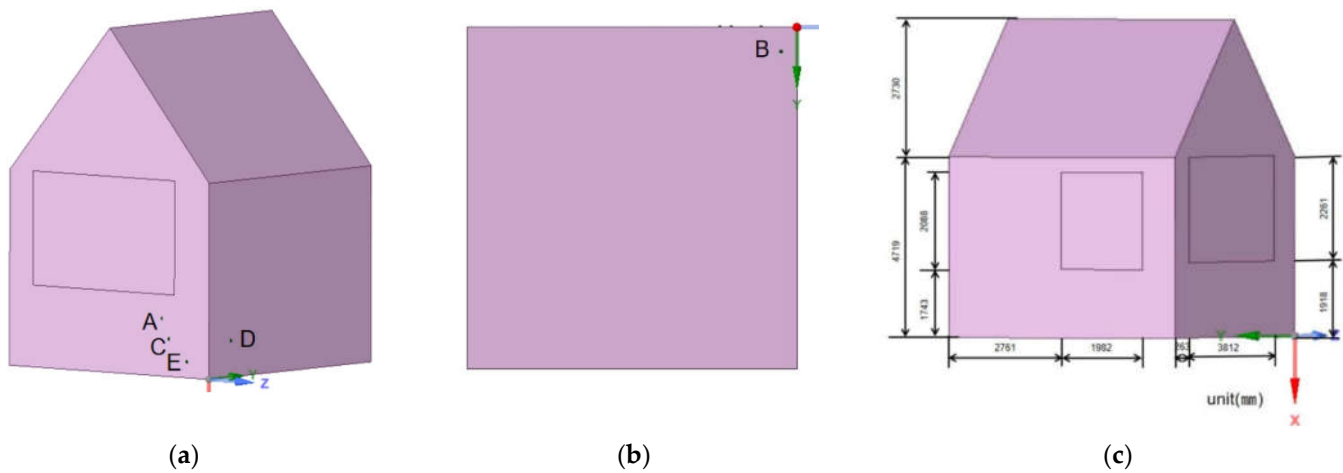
Structure of a palace-style wooden ancient building in Beijing: (a) South corner sample point, (b) Ground sample point and (c) Architectural model dimensional drawing.
